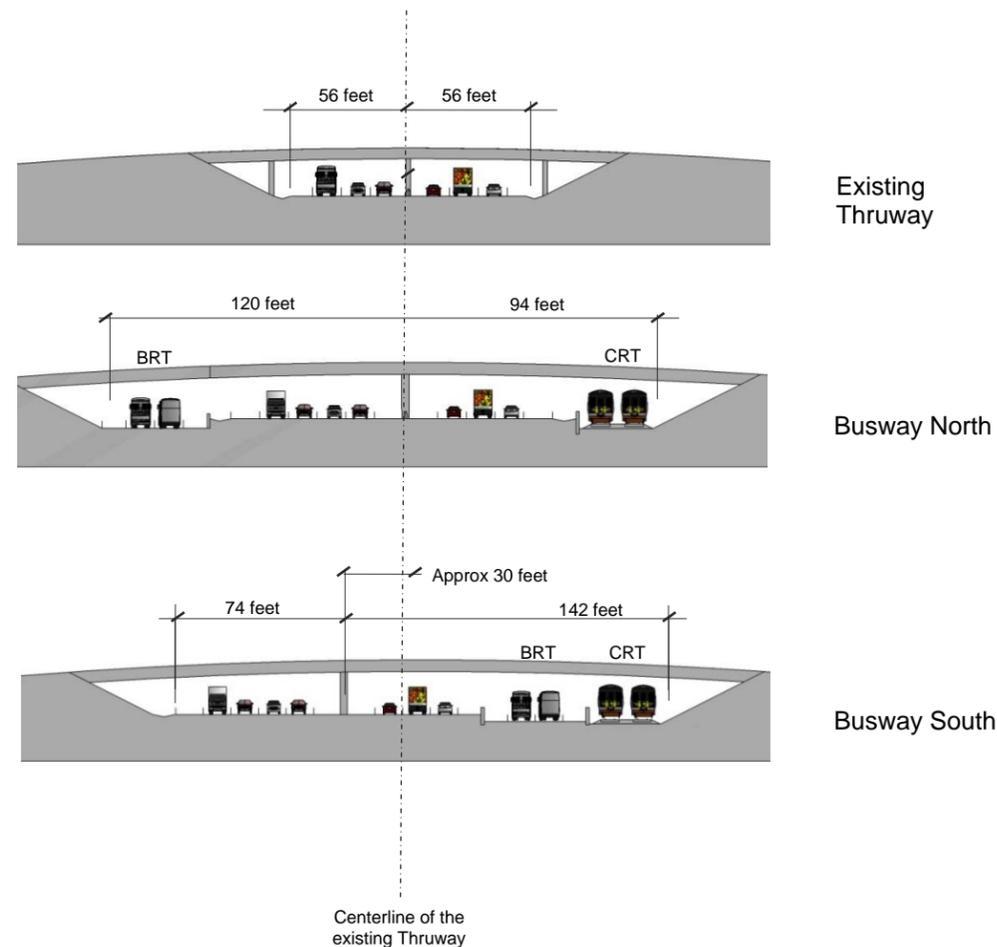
Comparison of Bridge Lengthening among Busway Options at a Typical Overbridge
